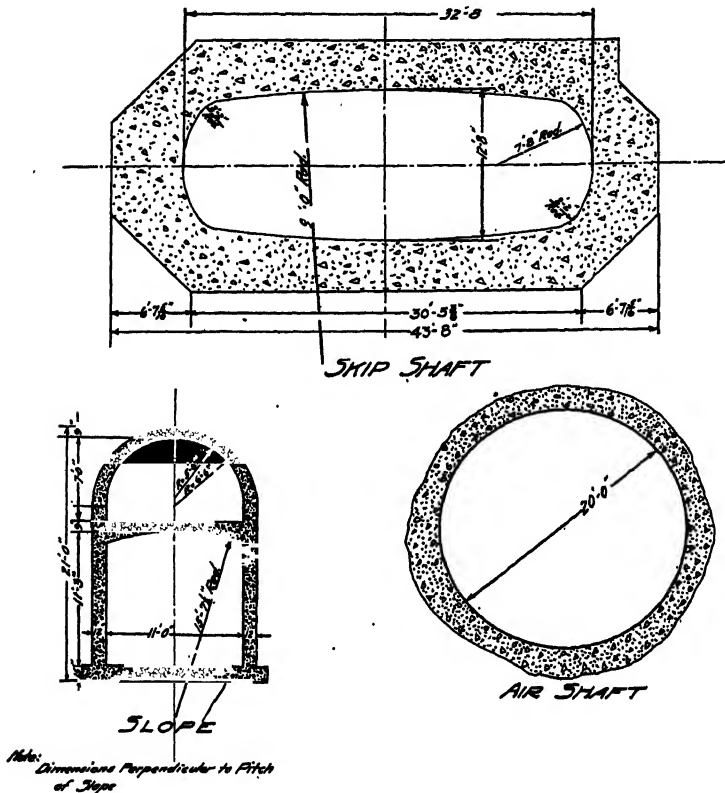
SKETCH SHOWING SECTION OF SHAFTS AND SLOPE, NEMACOLIN MINE OF THE BUCKEYE COAL CO.
